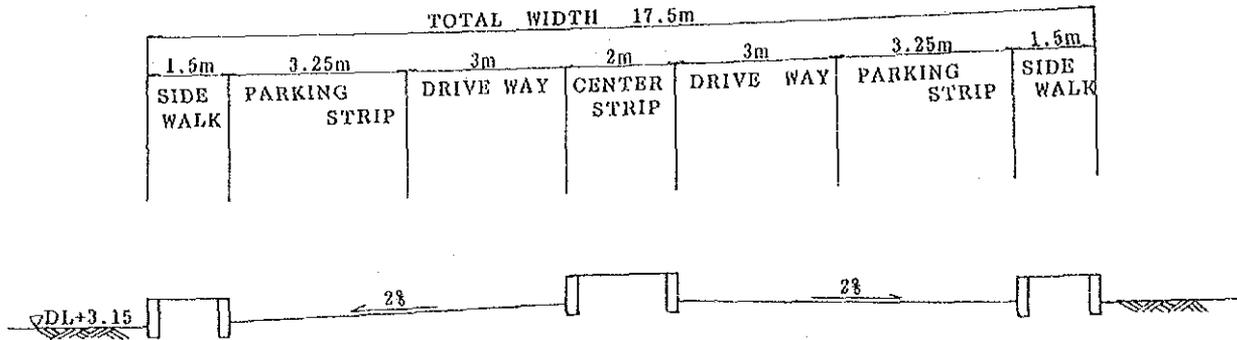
Typical Cross Section of Trunk Road in the Fishing Port
